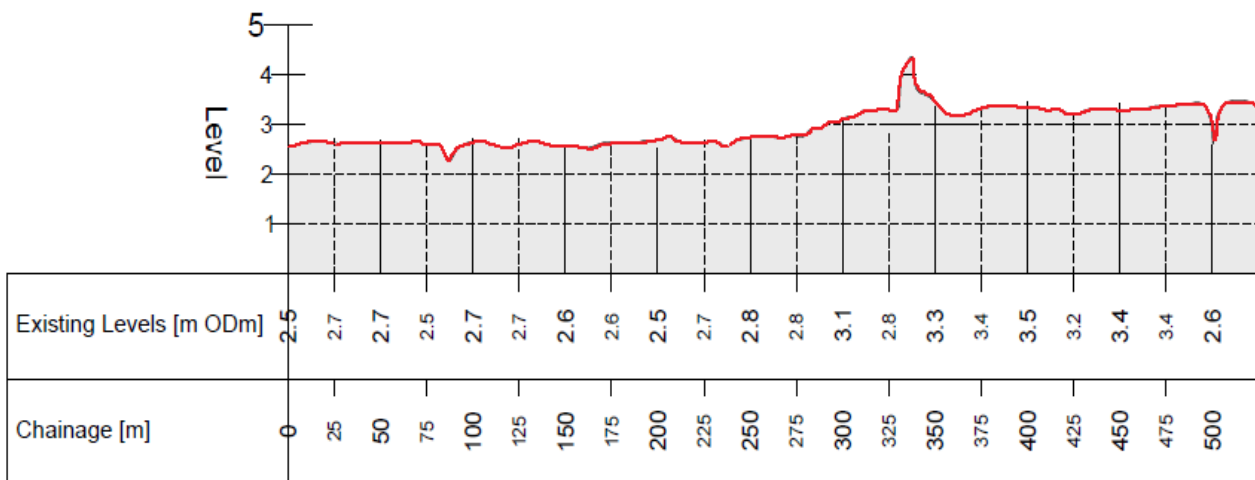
Long-section of the seawall alignment at Channel Road and Spout Lane (levels to ODm)
